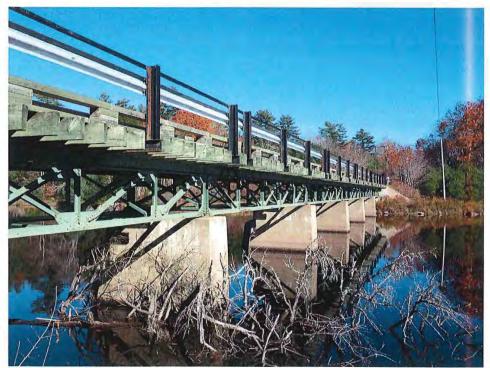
LOOKING AT S SIDE OF BRIDGE
